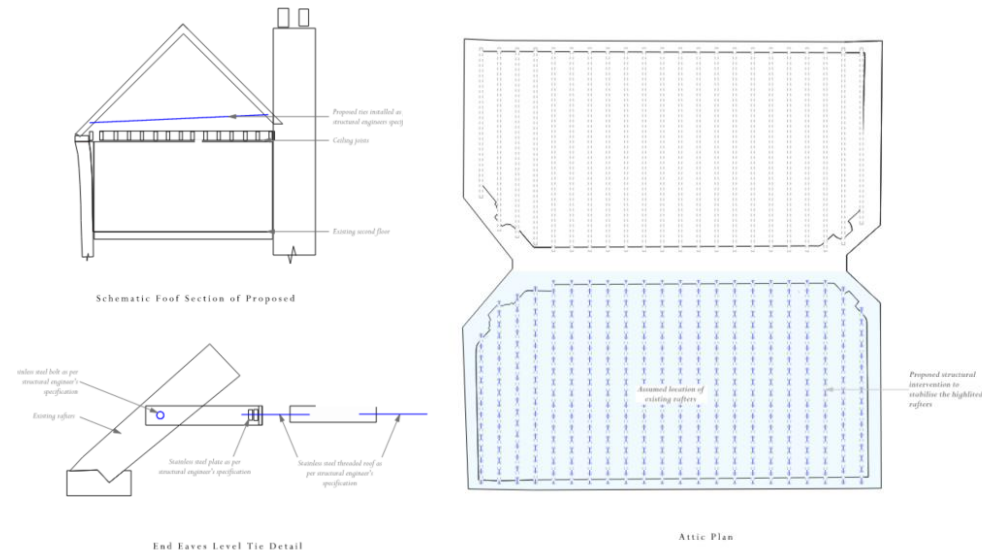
No. 3 Maids of Honour Row – Structural Intervention
